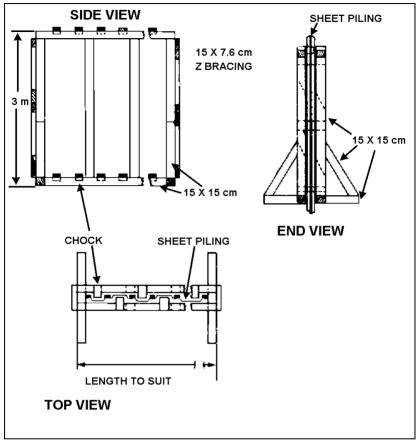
Waling Frame for 9 m Sheet Piling
